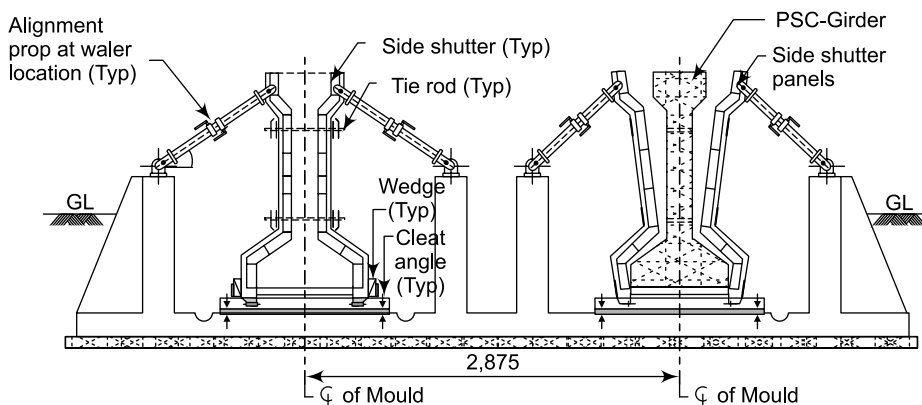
Mould Pit and Shuttering Arrangement for Precast I Girders.
